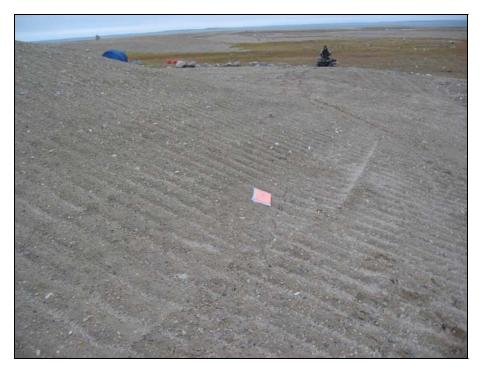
Typical tension crack looking south along west slope. Fine tension cracks (up to 3 sets) often appear adjacent to and parallel to the larger (e.g. 1 to 2 cm width) cracks . •
